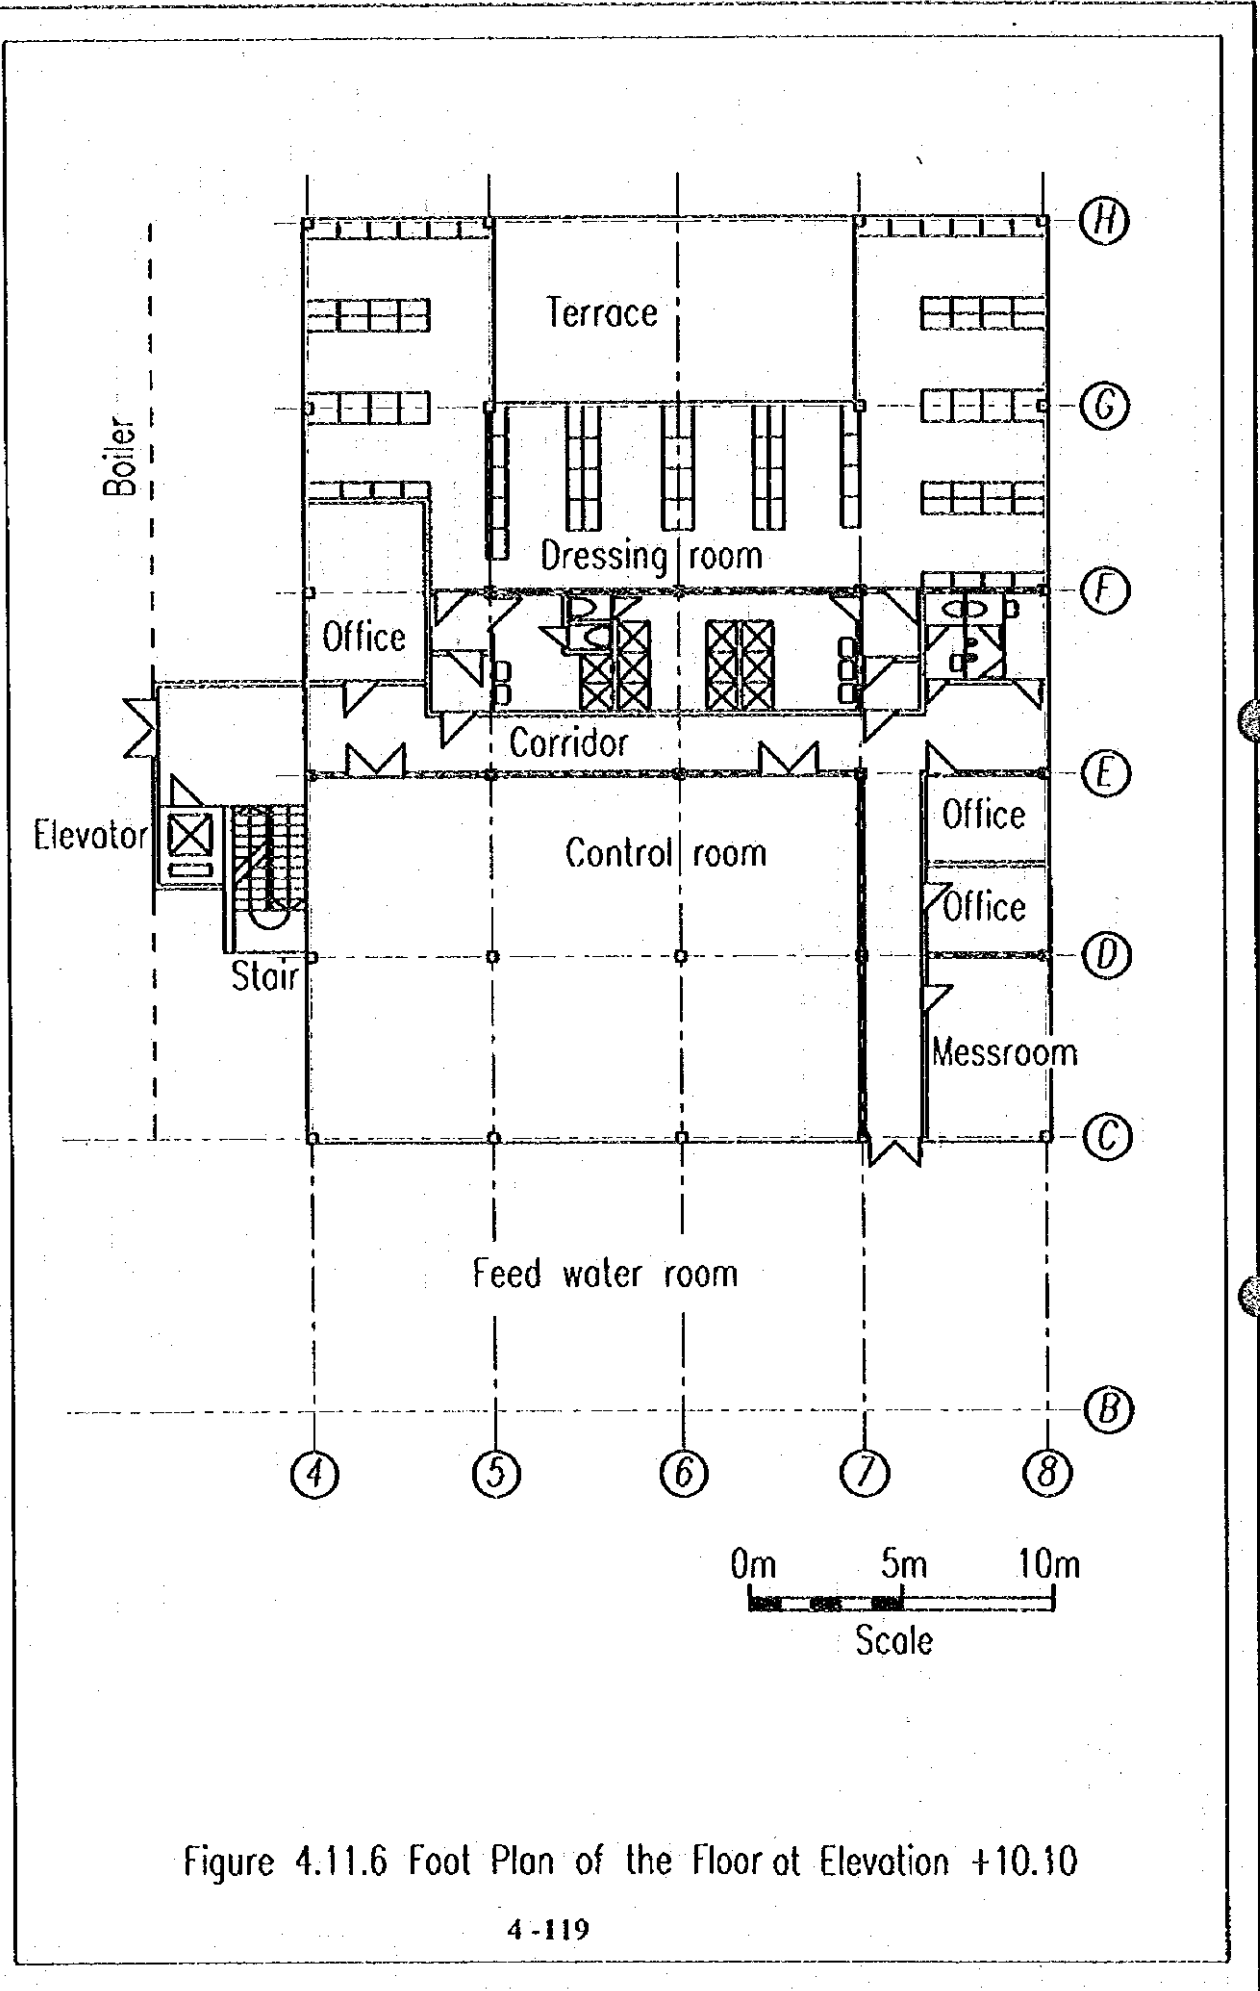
Foot Plan of the Floor at Elevation +10.10
